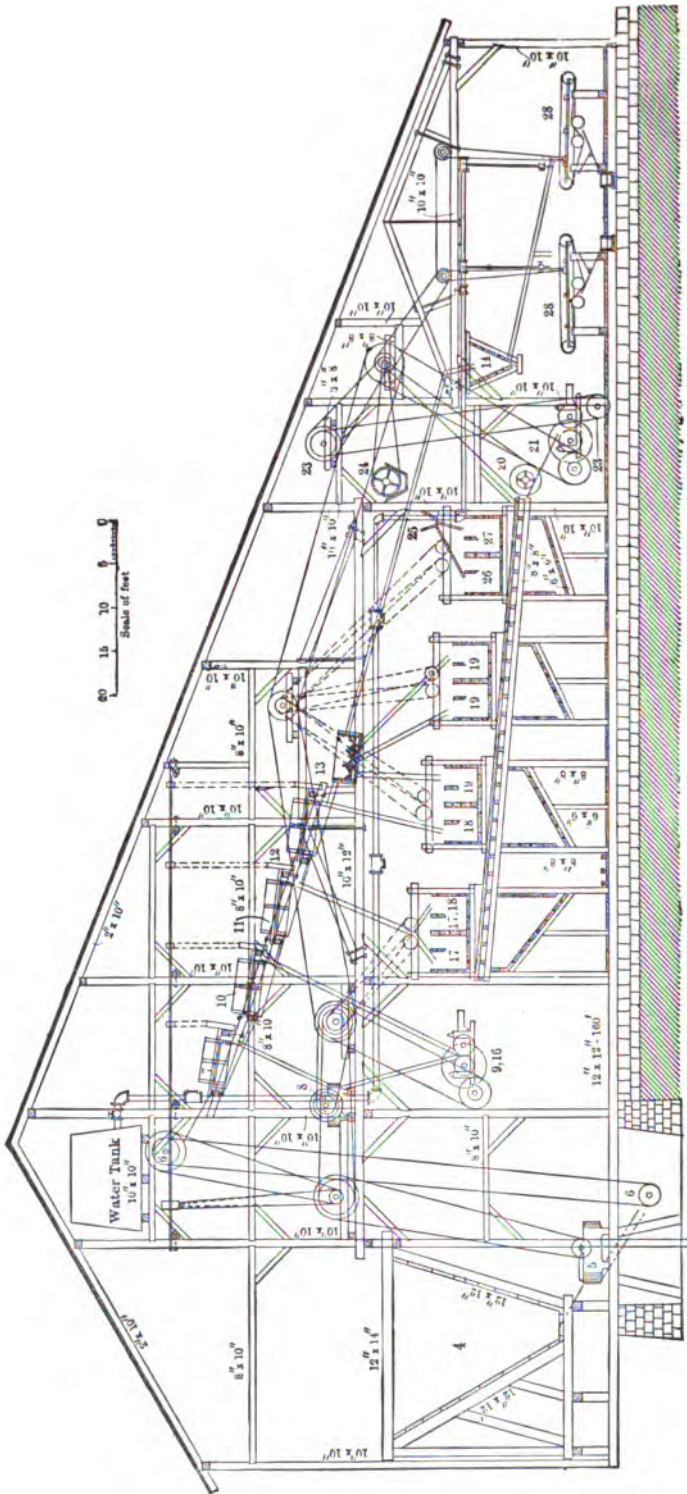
SECTION OF MILL ON LEVEL SITE.
